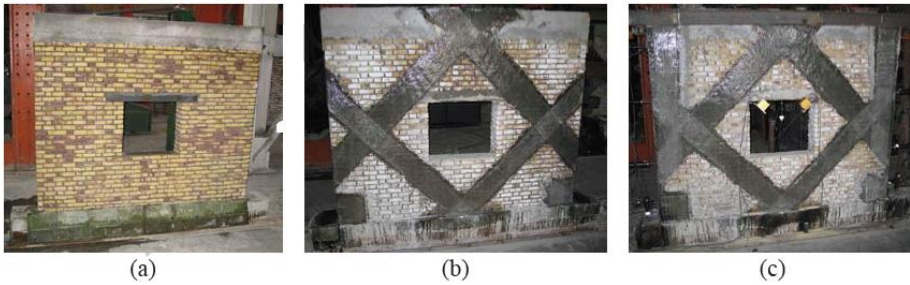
Openings in unreinforced masonry test under cyclic loading [46]
